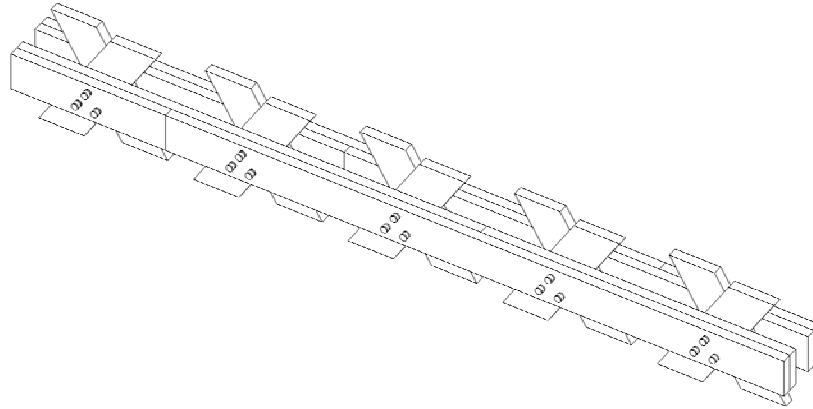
Section of Town lattice truss chord showing staggered member terminations
